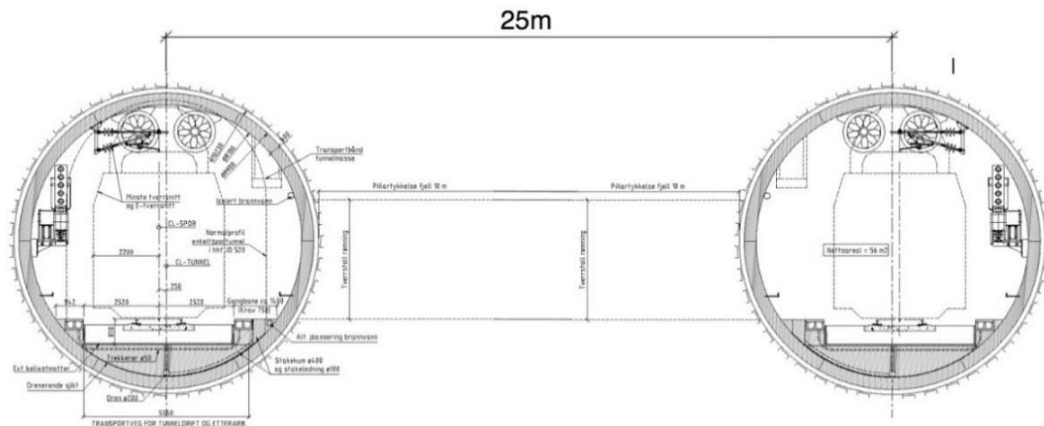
Cross Section of the Follo Tunnel Twin Tubes
